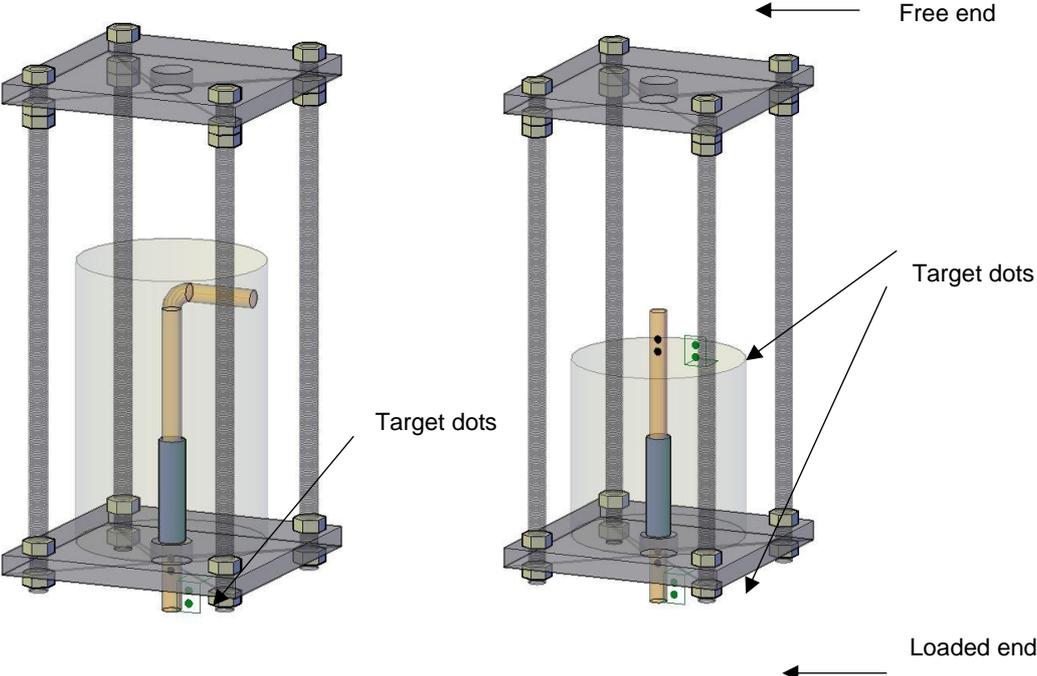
Pull-out test setup used: (left) bent rebars; (right) straight rebars.
